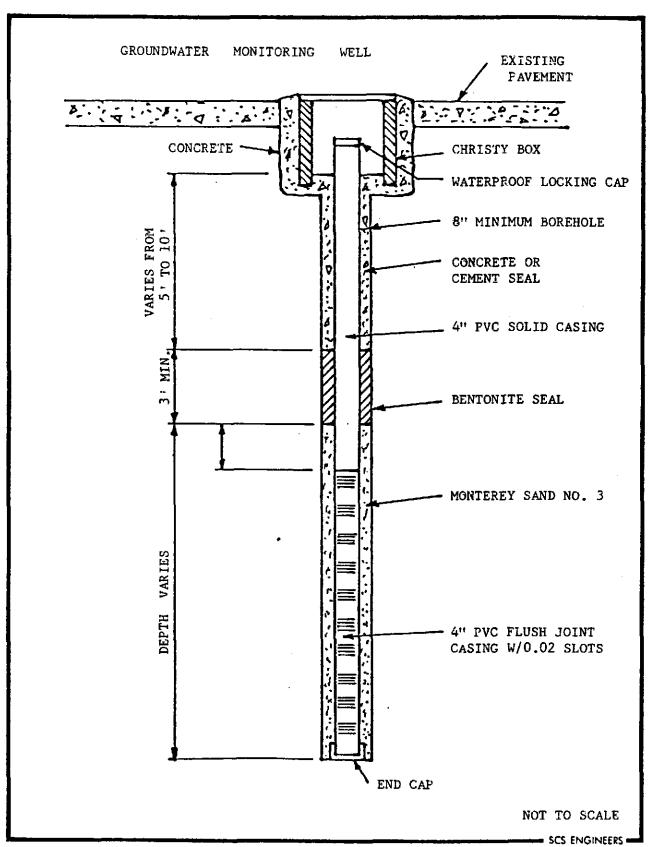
Typical Well Construction Details for the Installation of Groundwater Monitoring Wells
